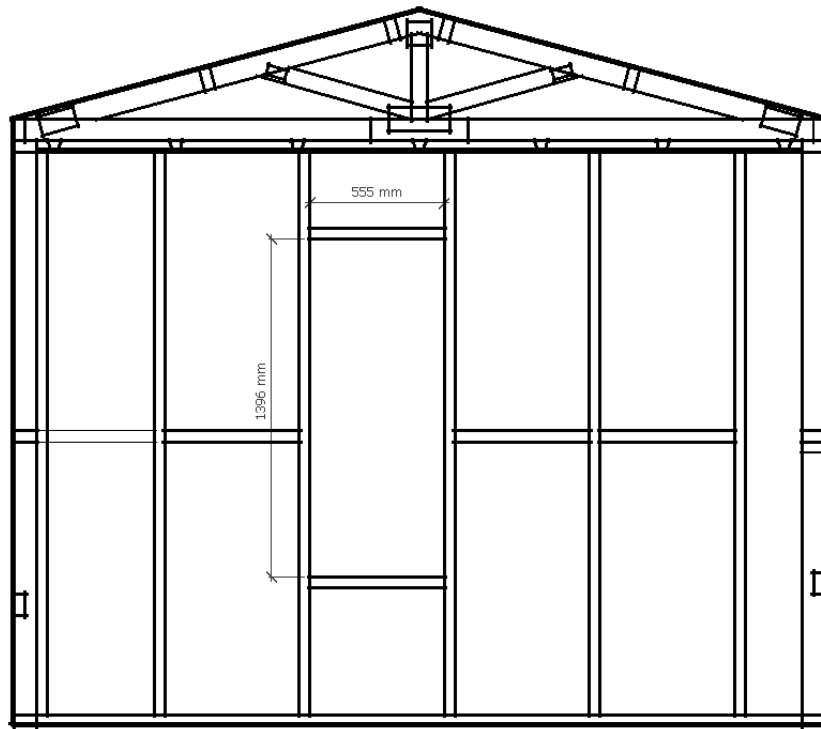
Experiment #2 outside view of free end wall framing and window opening for Experiment #2
